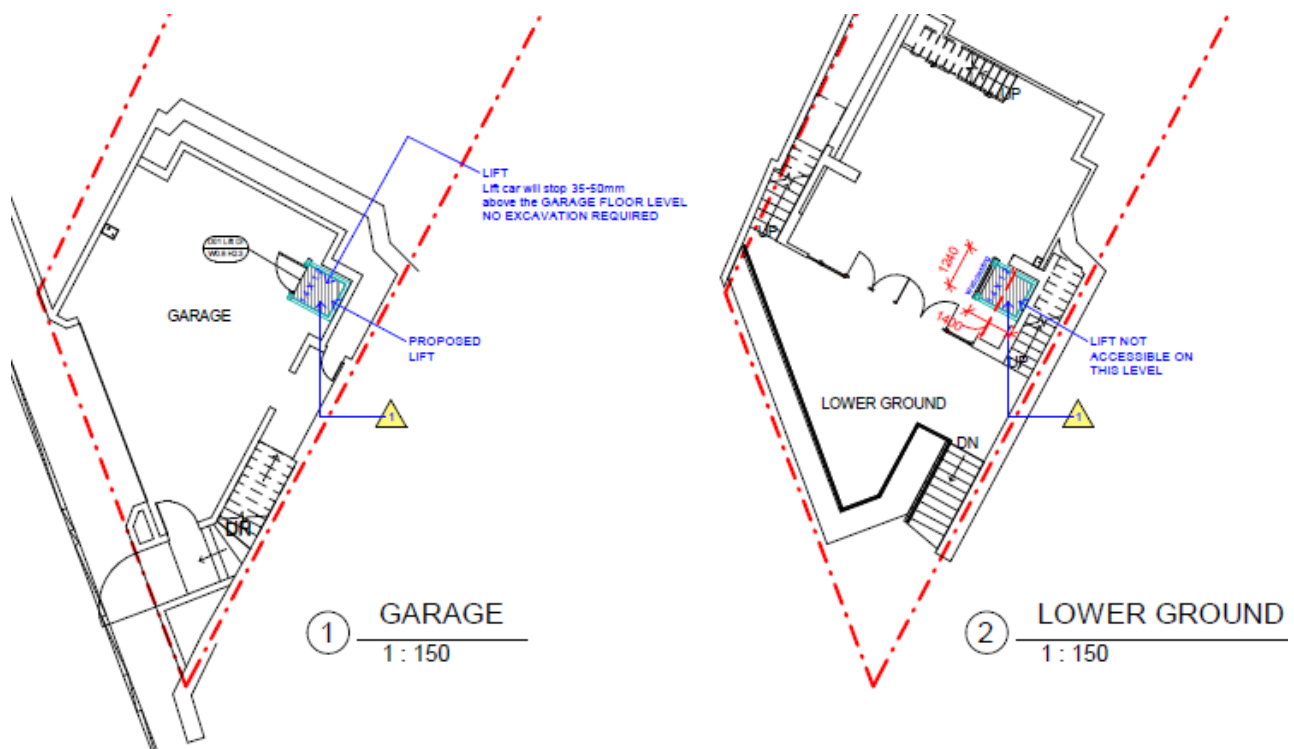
Proposed garage and lower ground floor plans (Source: Architectural Plans)
